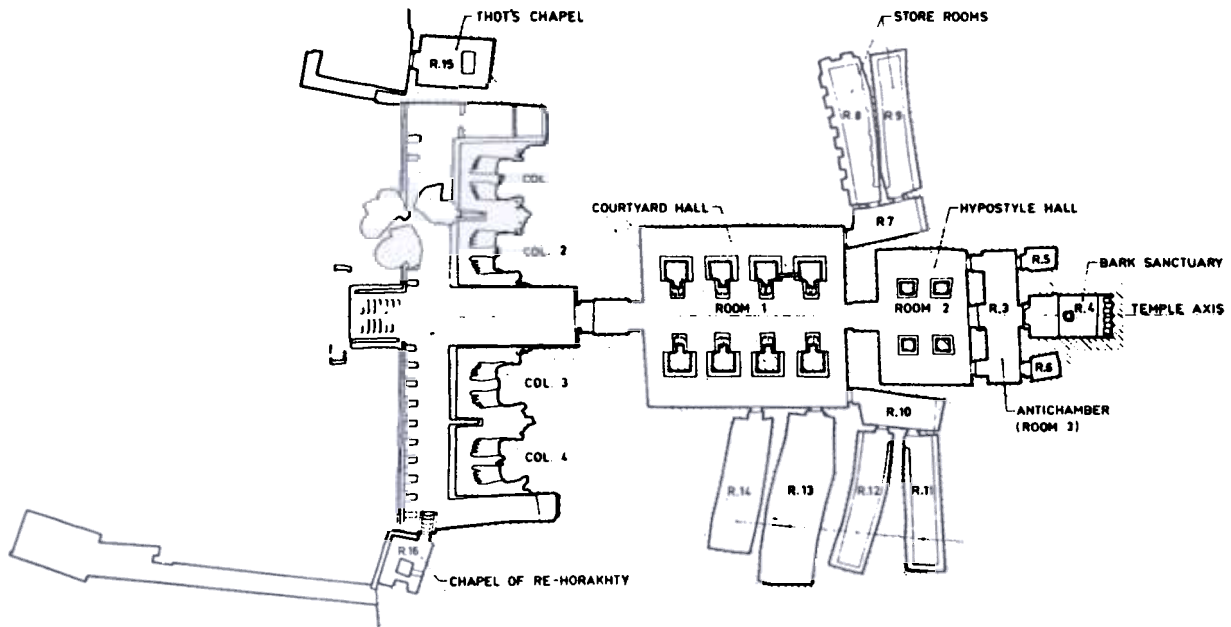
Horizontal section through the façade and the rooms of the Great Temple.
